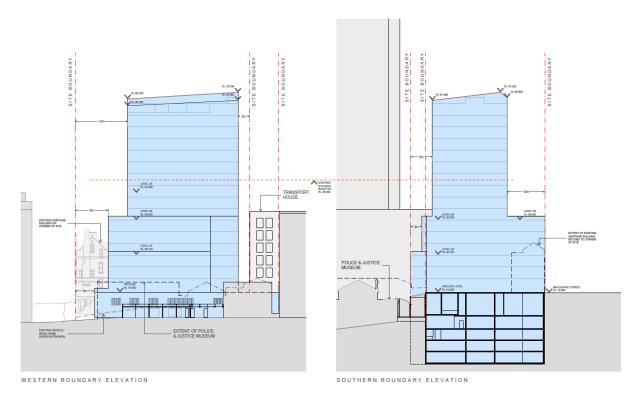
Proposed maximum envelope elevations to the western boundary (left) southern boundary (right)
